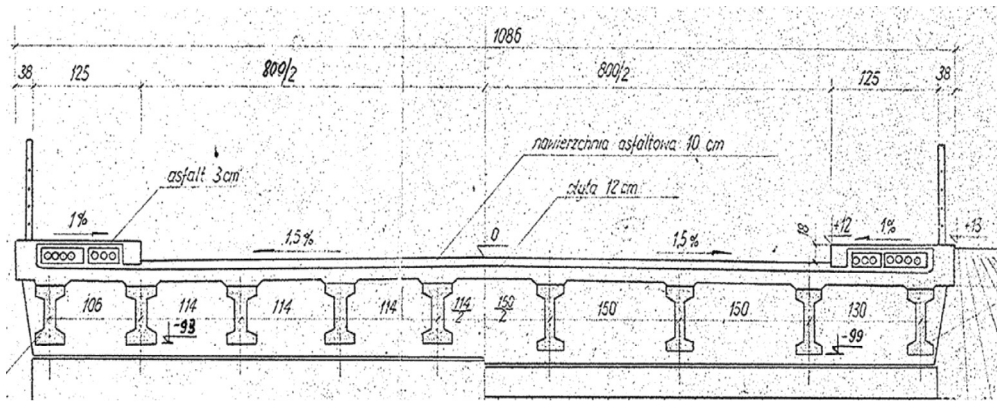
Beams and deck bridge section. Left: center span. Right: lateral spans.
